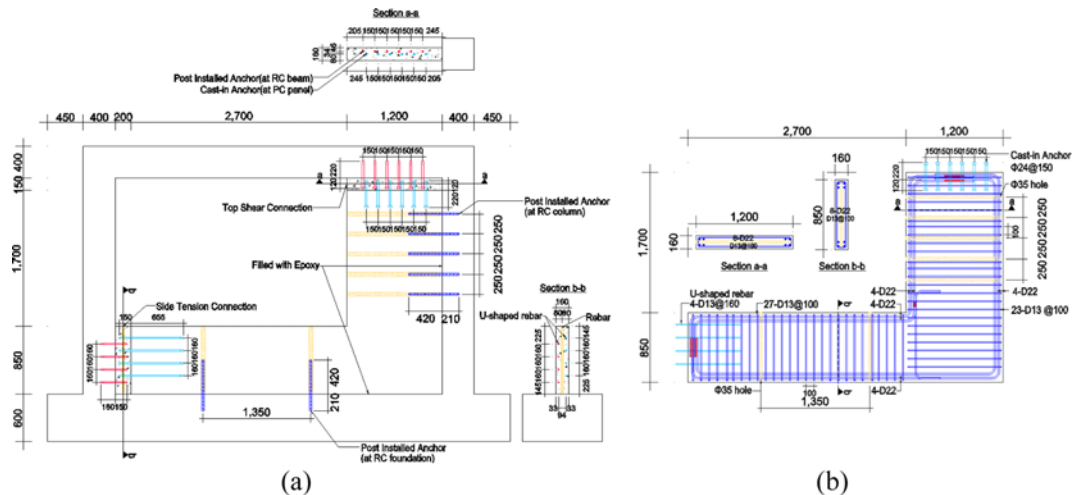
Dimensions and Reinforcement of Specimen LA4-H5V2 (mm): (a) RC Frame with PC Wall Panel, (b) PC Wall Panel
